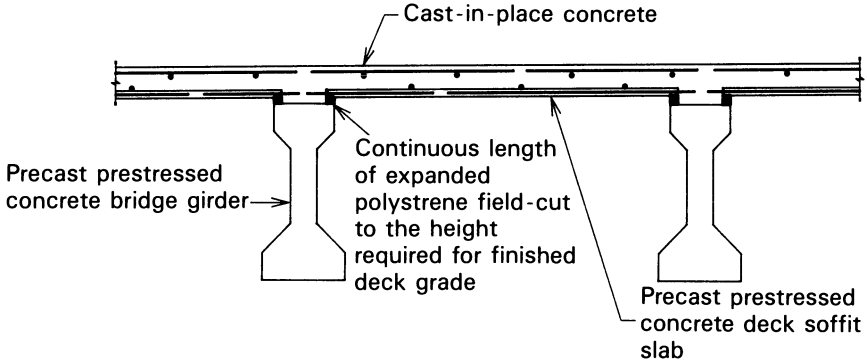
Partial section of a bridge with precast prestressed-concrete slabs used as stay-in-place forms for the deck.
